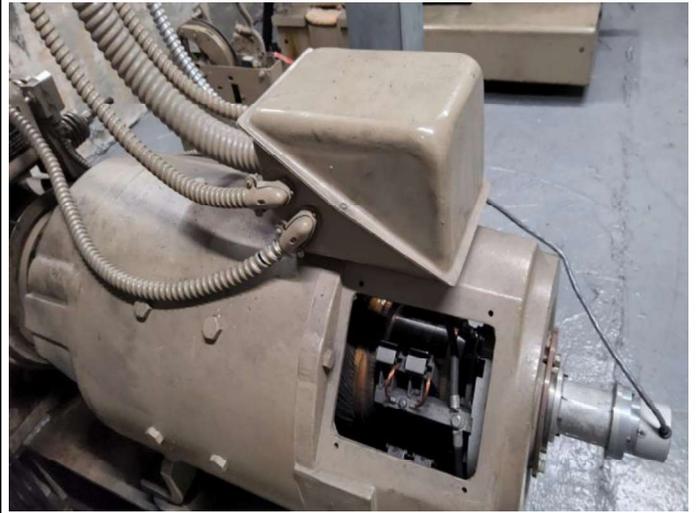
Item 27.a. Roof. Elevator room. Missing motor cover protection.
